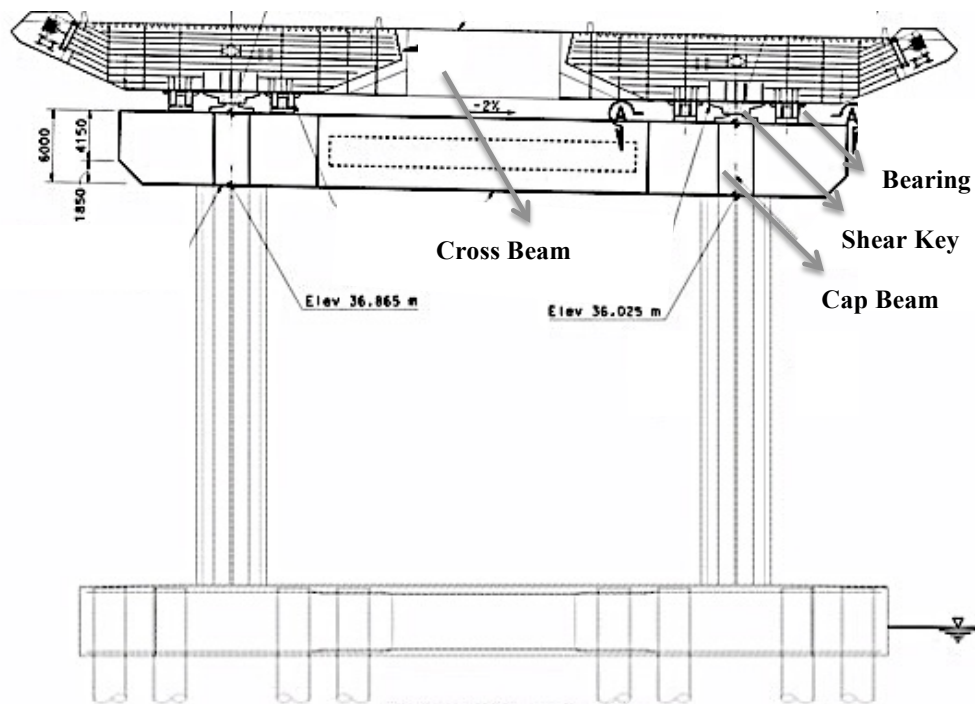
East pier transverse elevation with pile cap, piers, cap beam, double deck and deck anchorage [Ref.: Caltrans].
